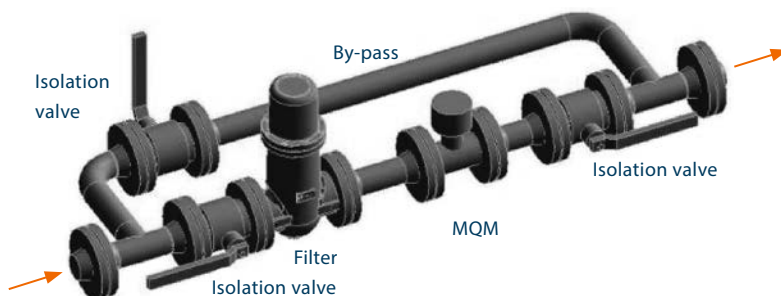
Typical horizontal installation of the MQM Quantometer (recommended)
